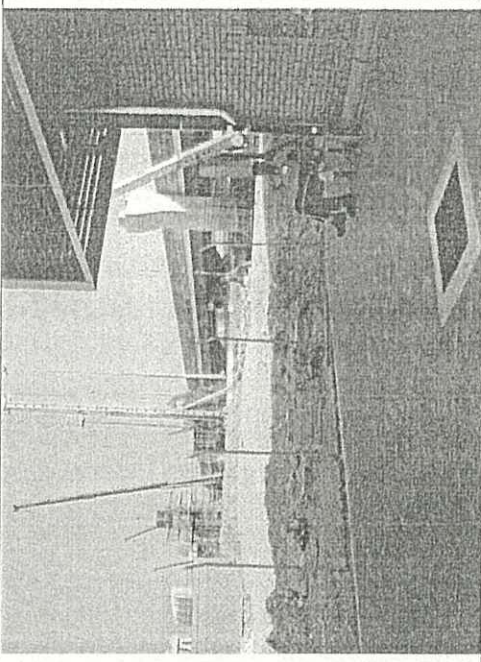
Construction works at Lai Wan Chiller Plant Building undertaken by Route 9 Contractors. Landscape works will resume afterwards.
